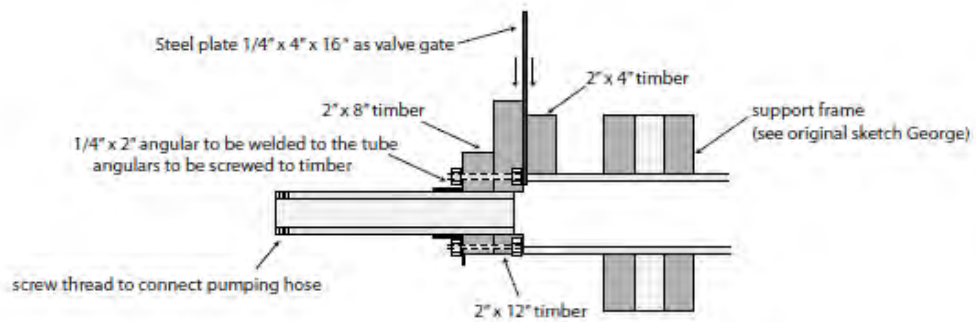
Pumping line connected to the one end of the formwork and concrete pressure indicator tower to monitor pressure build-up exerted on the formwork
